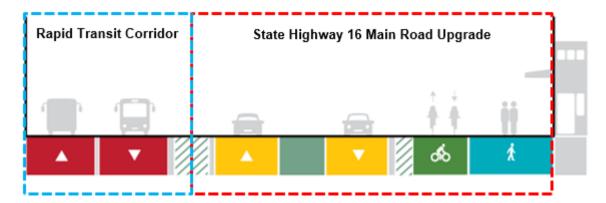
Indicative future SH16 Main Road Upgrade cross sections
